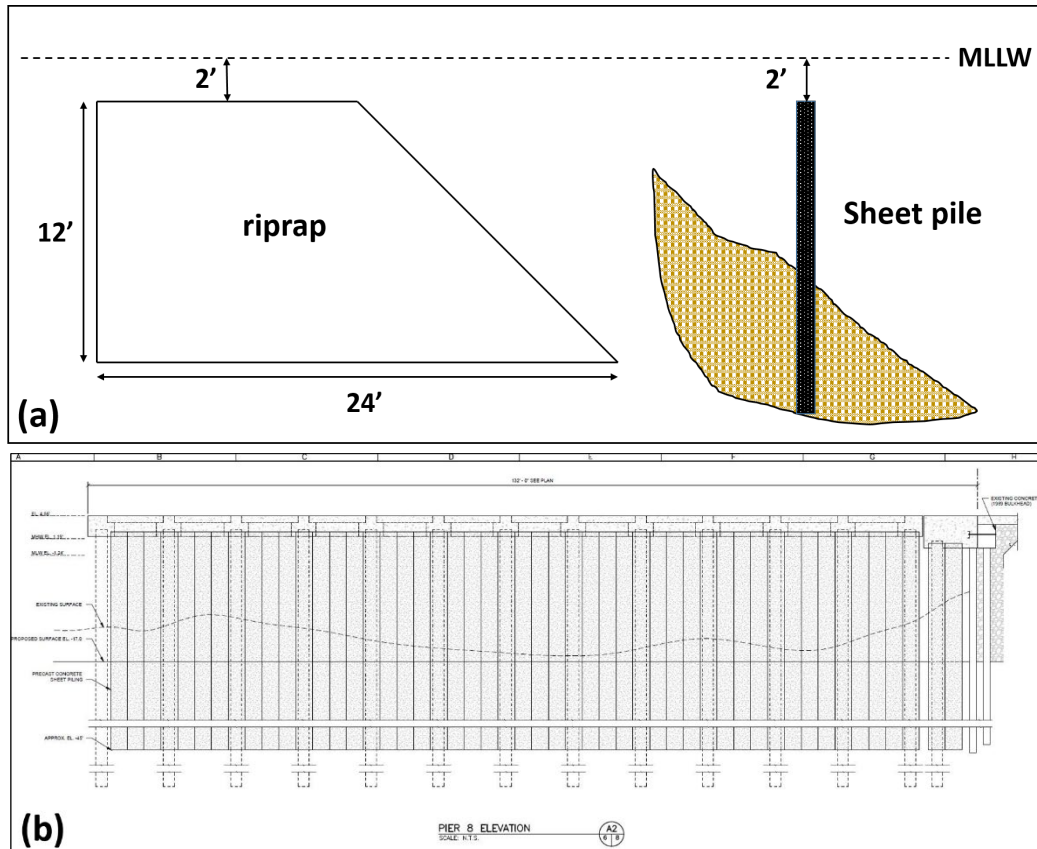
Design sketches of (a) the riprap and sheet pile and (b) the modified piers and wave screen at Third Port.
